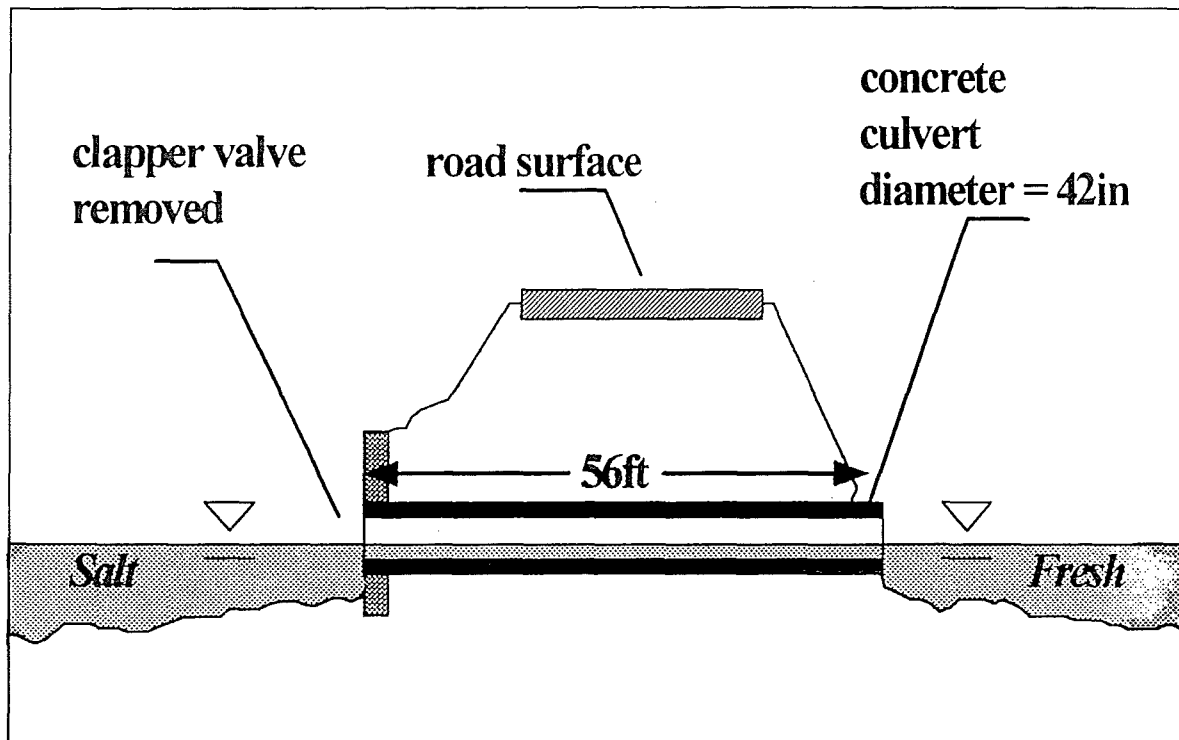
Cross sectional view of Wilders Dike with clapper valve removed
